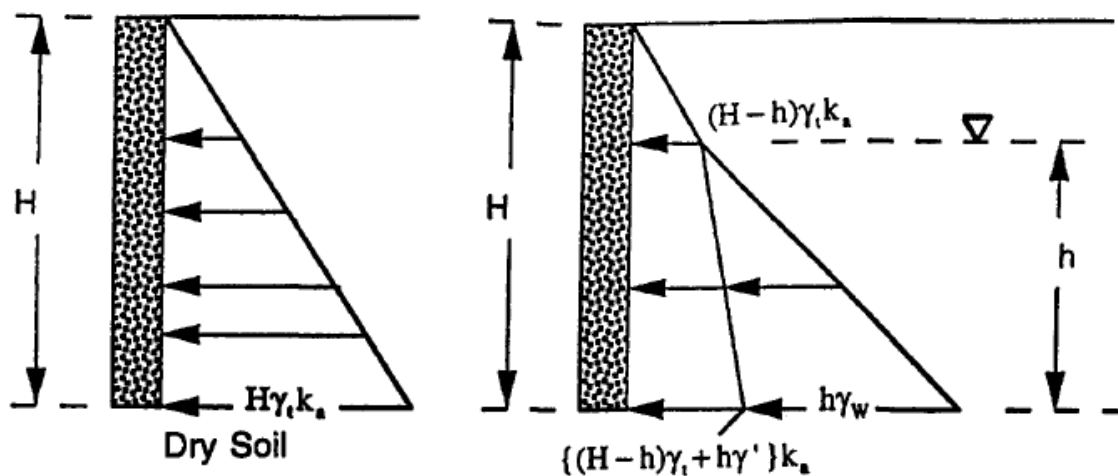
Soil with water table above the wall base (D'Andrea, 1998)
